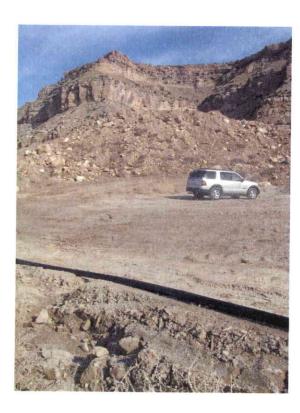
Southwest corner of topsoil pile. Operator has not constructed a berm/silt fence to prevent erosion of topsoil. Runoff from pile is visible along left side of photo.
